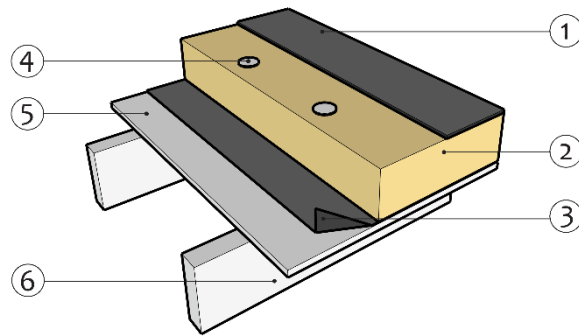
1. Rainscreen on cross battens (not shown) over two layers of waterproof membrane 2. rigid PIR insulation, 3. vapour barrier, 5. ply then timber sarking 6. rafters
